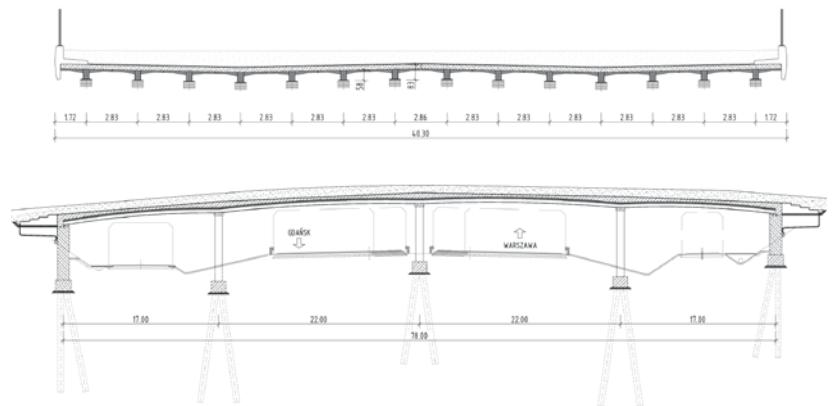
, Longitudinal section and span cross section of wildlife bridge PE-4
